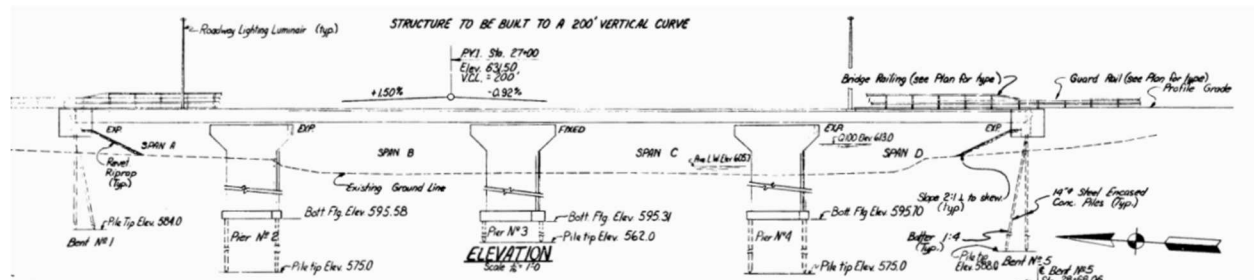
Elevation View of Bridge (NBI 19430) (1982)
